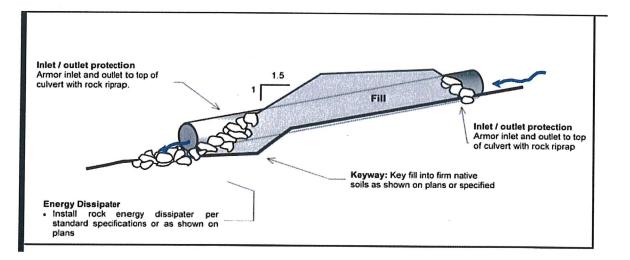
B. Riprap armor at culvert inlet (Keller and Sherar, 2003).
